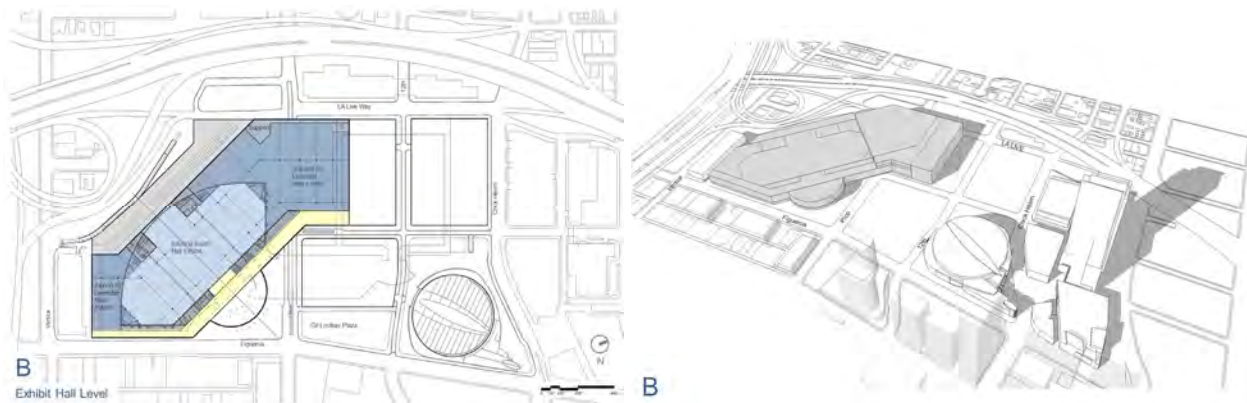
Exhibit level floor plan and massing – concept design scheme B (180,000ft<sup>2</sup> of net new exhibit space)
